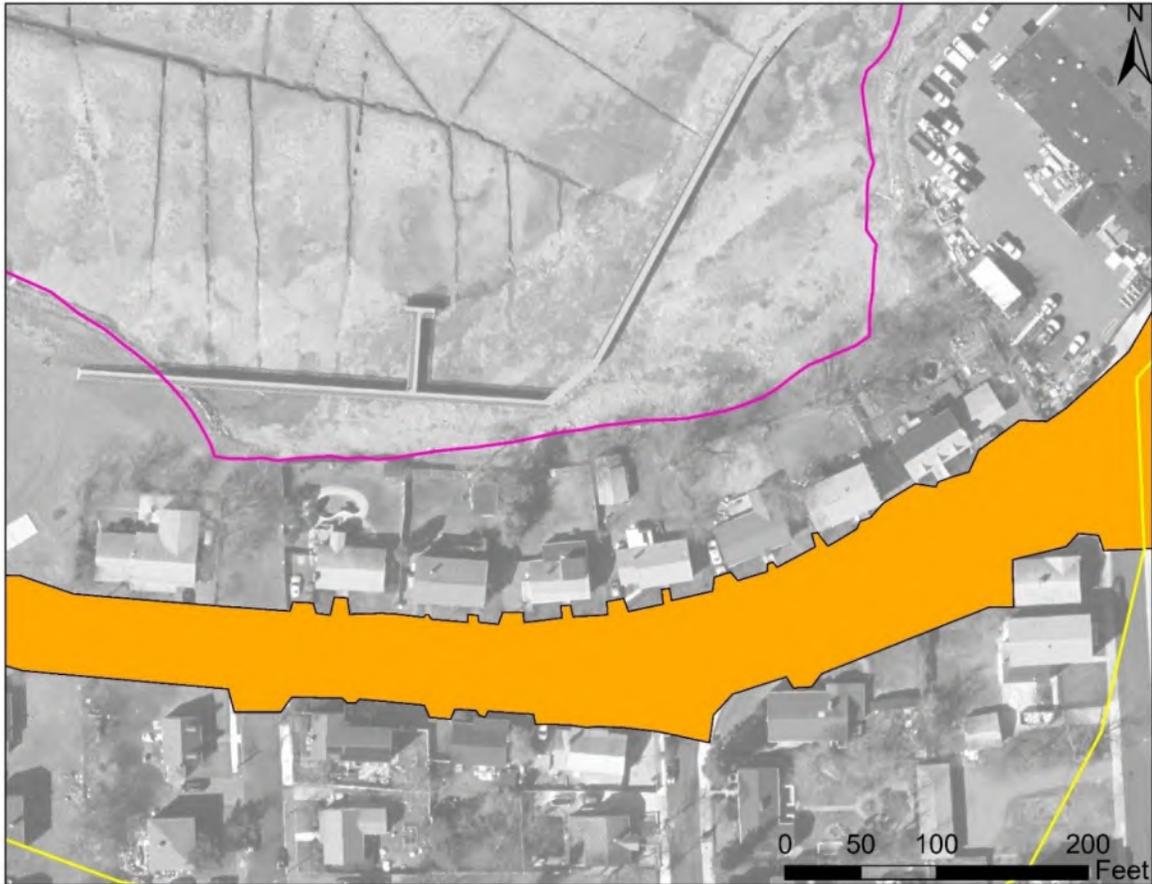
Banks Street with an elevation of 10 ft (NAVD88) in plan view showing impacts of fill to private parcels.
